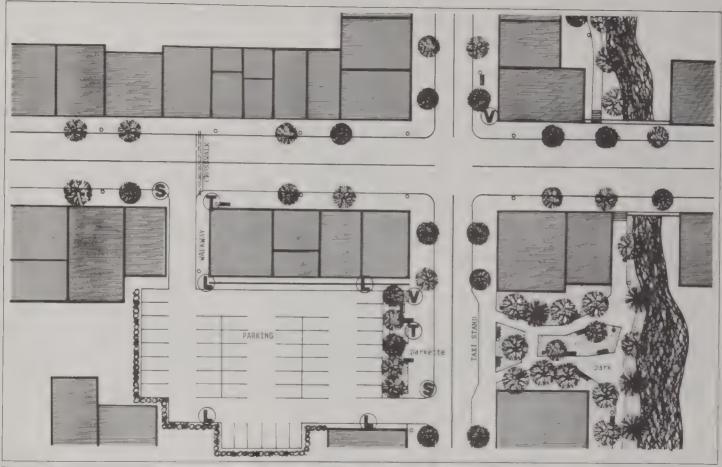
Plan 5, higher budget improvements to an intersecting Main Street, incorporating the river as als gnificant natural feature into the streetscape. Parking will be removed from Main Street with a sizable parking lot provided to the rear of the buildings. The lot will be screened from view by a parkette and hedge row.
